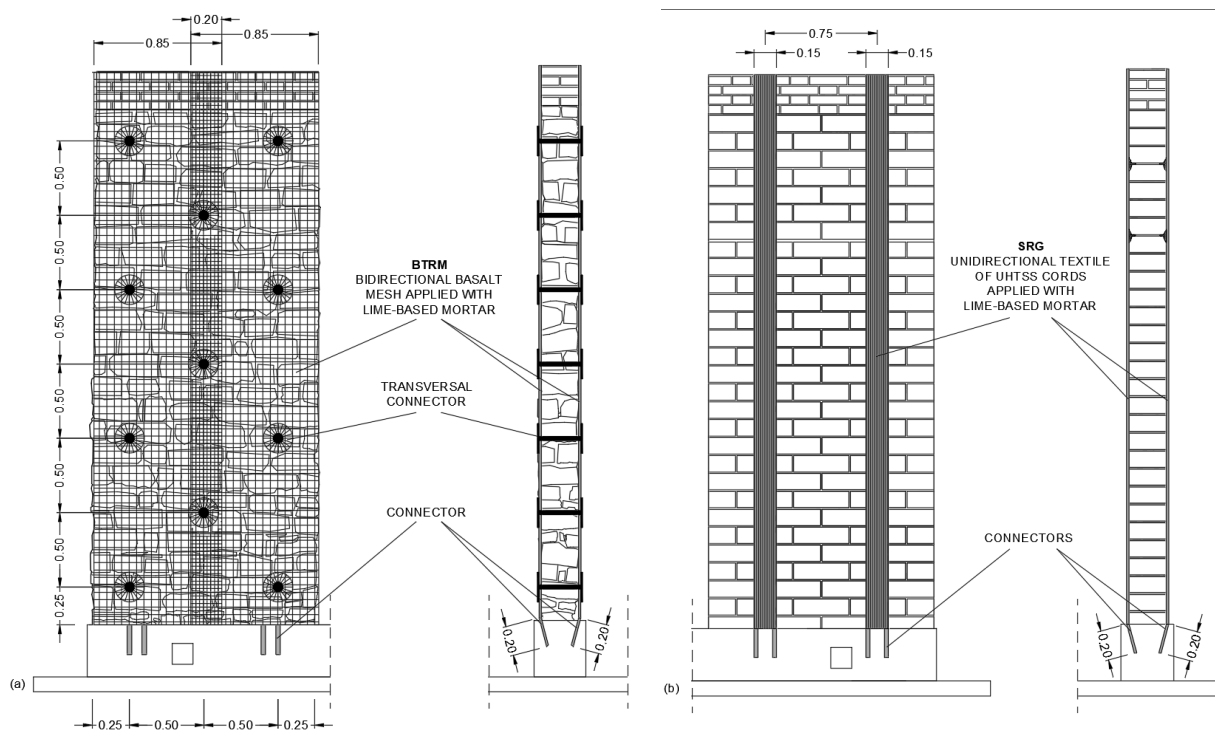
Retrofitting design for the stone (a) and tuff (b) walls
